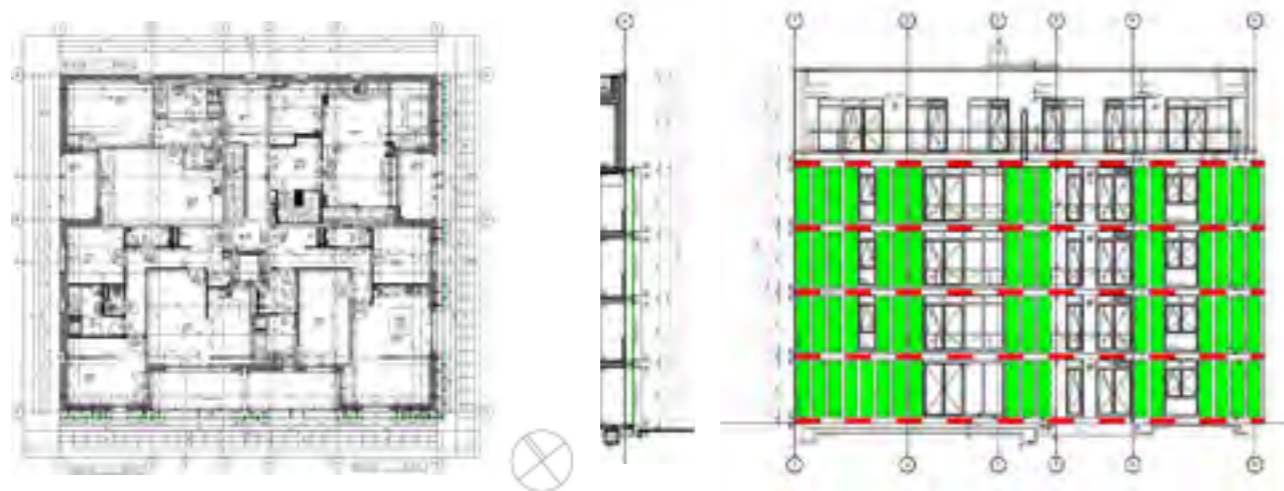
The Algae House - Plan, Section & Elevation (Arup, 2013)
